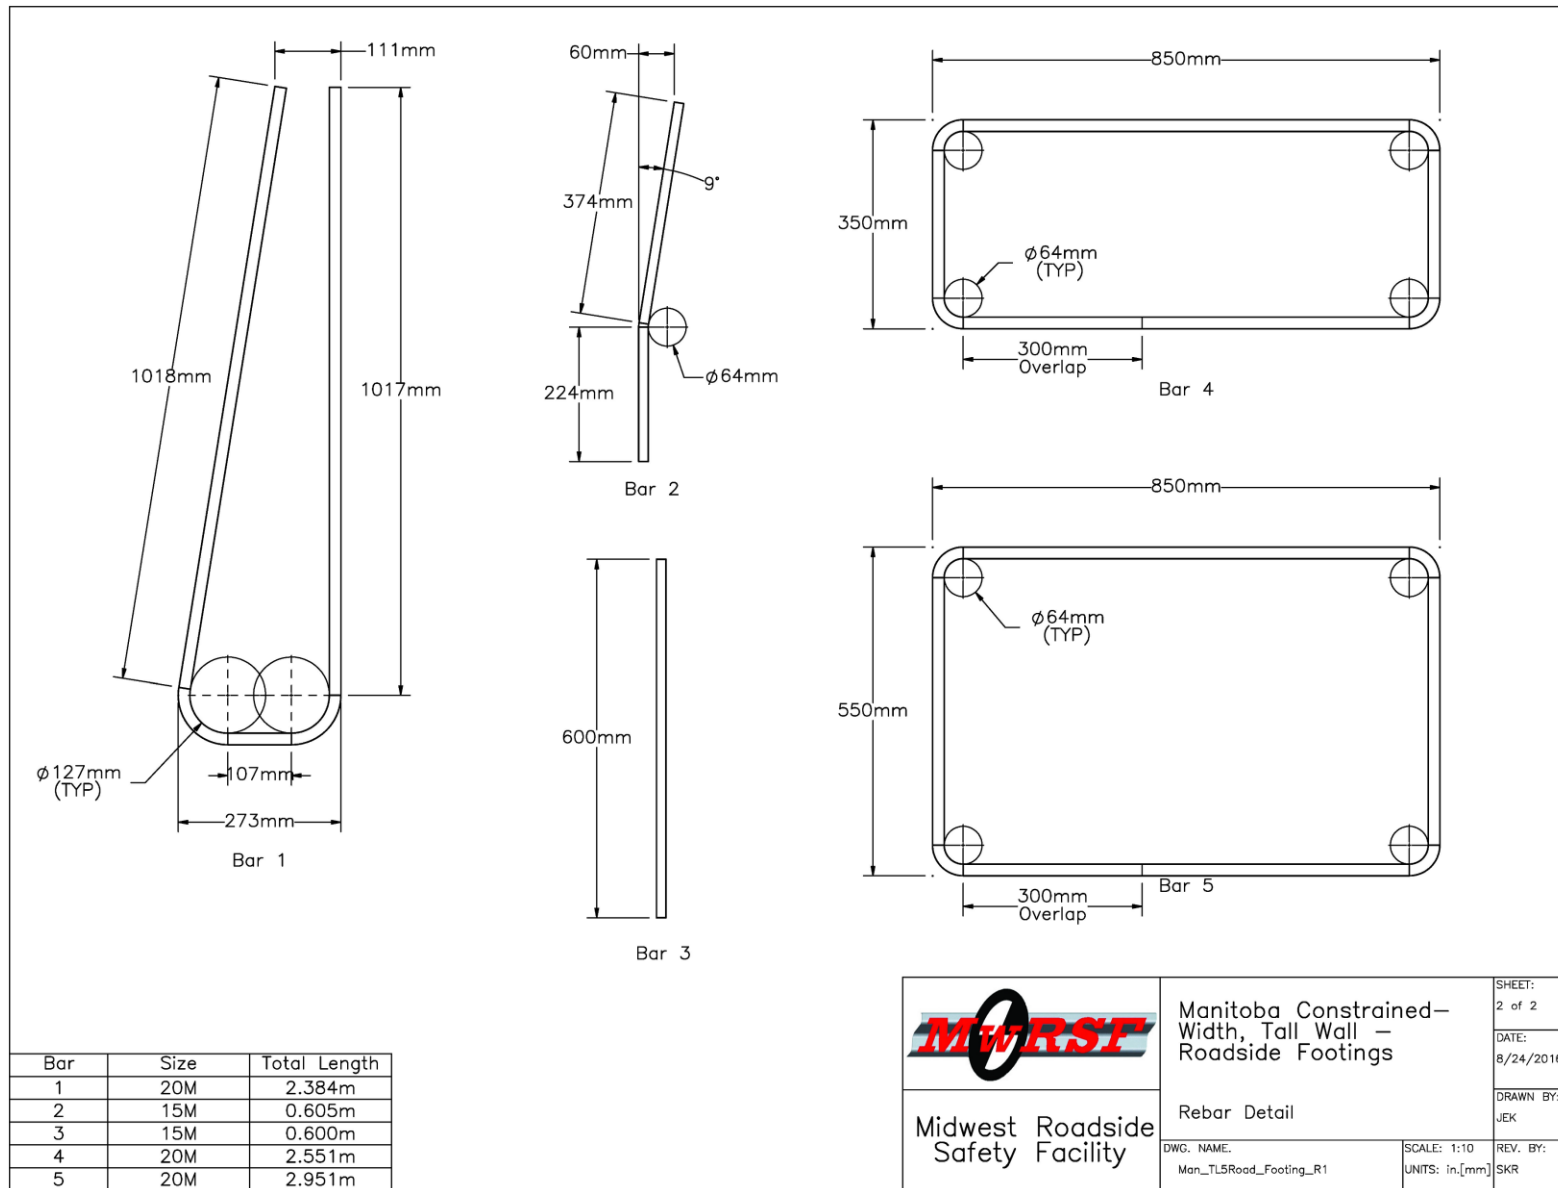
TL-5 Roadside Configuration Footing Reinforcement Details
